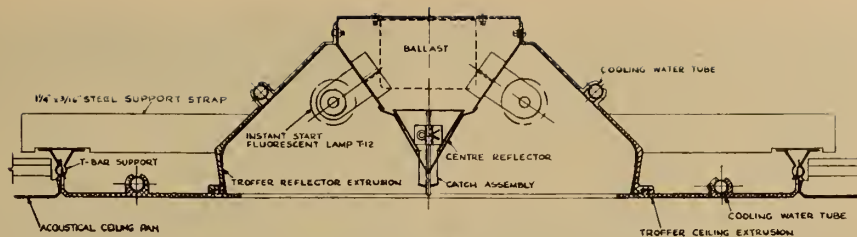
Section through luminaire for Manufacturers Life Building showing water-cooled reflectors and ceiling extensions.
